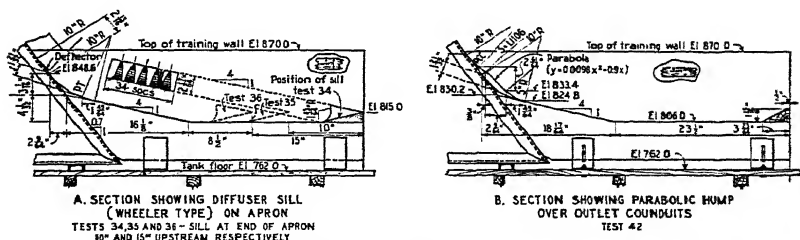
A. Wheeler type diffuser sill. B. Parabolic hump over outlet conduits.
